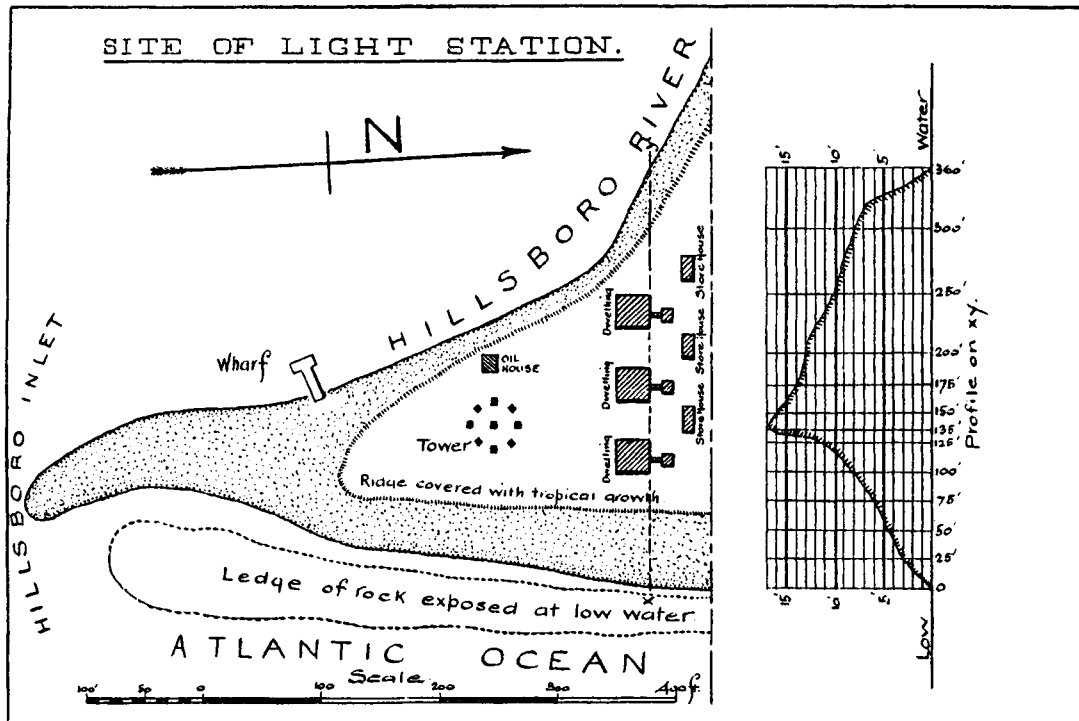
U.S. Lighthouse service contract plans (plate 38) 1904.
